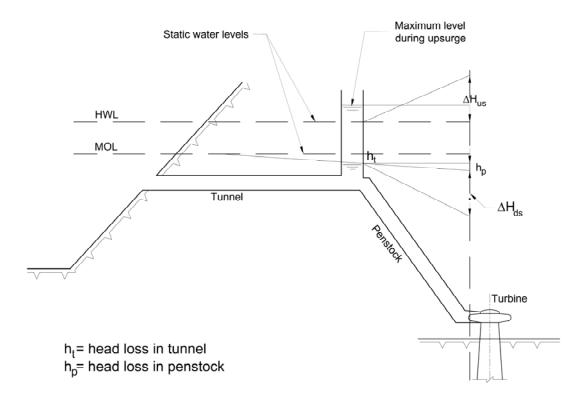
General Water Conduit Profile with Design Pressure Diagram (Source: Handbook on Hydraulic Computations by P.G. Kiselev, 1957)
